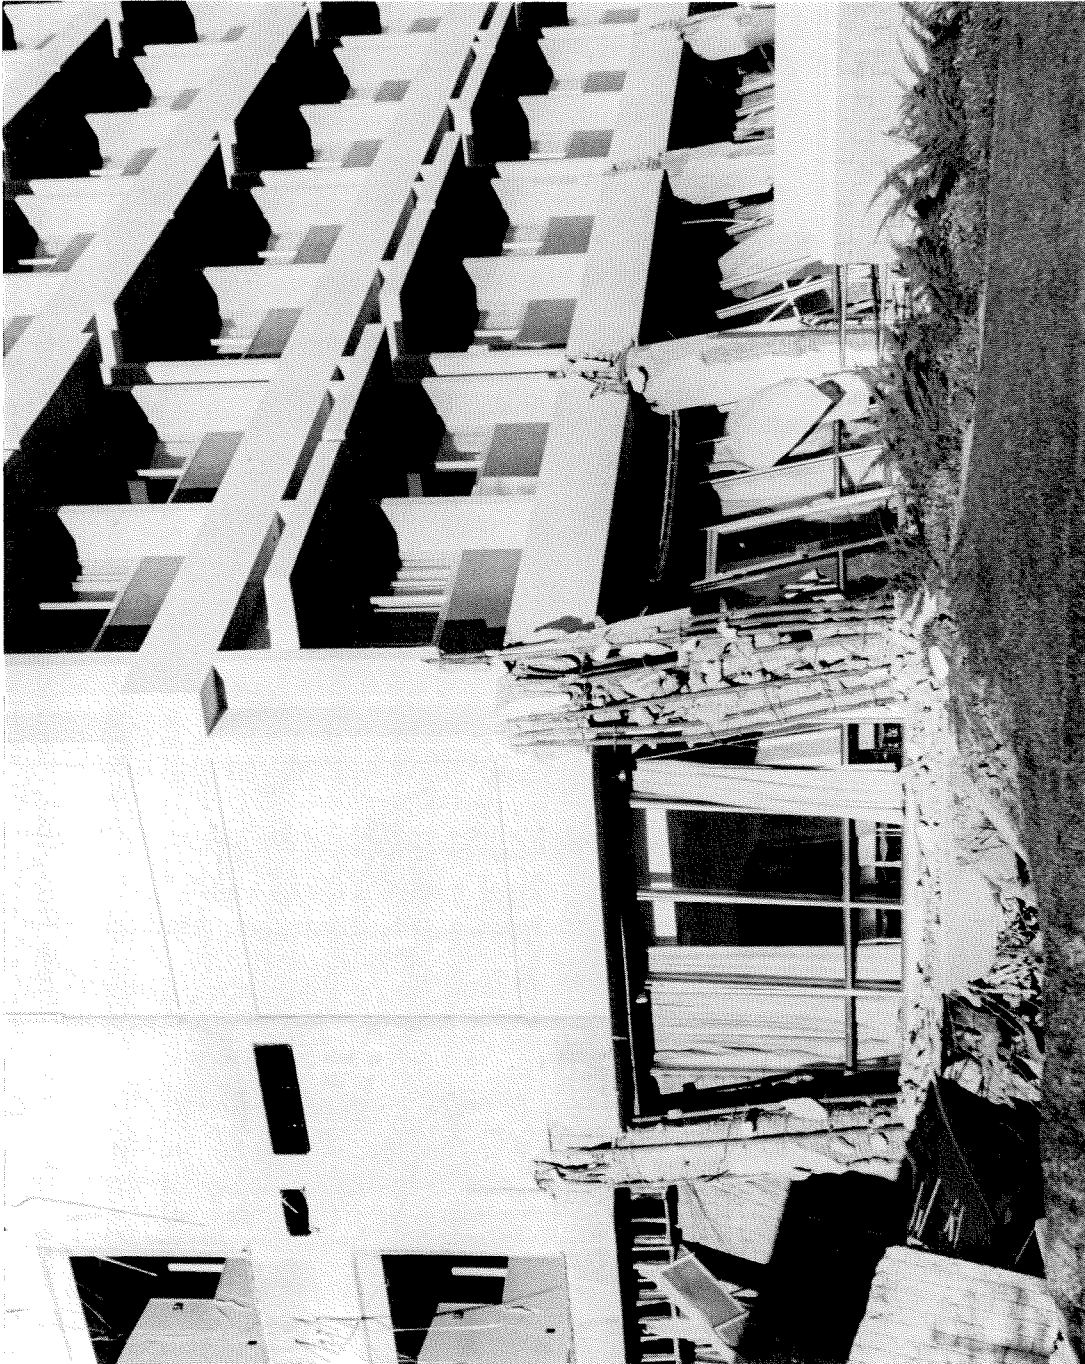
19 Olive View Hospital; west end of north wing. The collapsed stairwell is at the left. The shattered L-shaped corner column did not have a spirally wound core as did the other columns in the photo.
